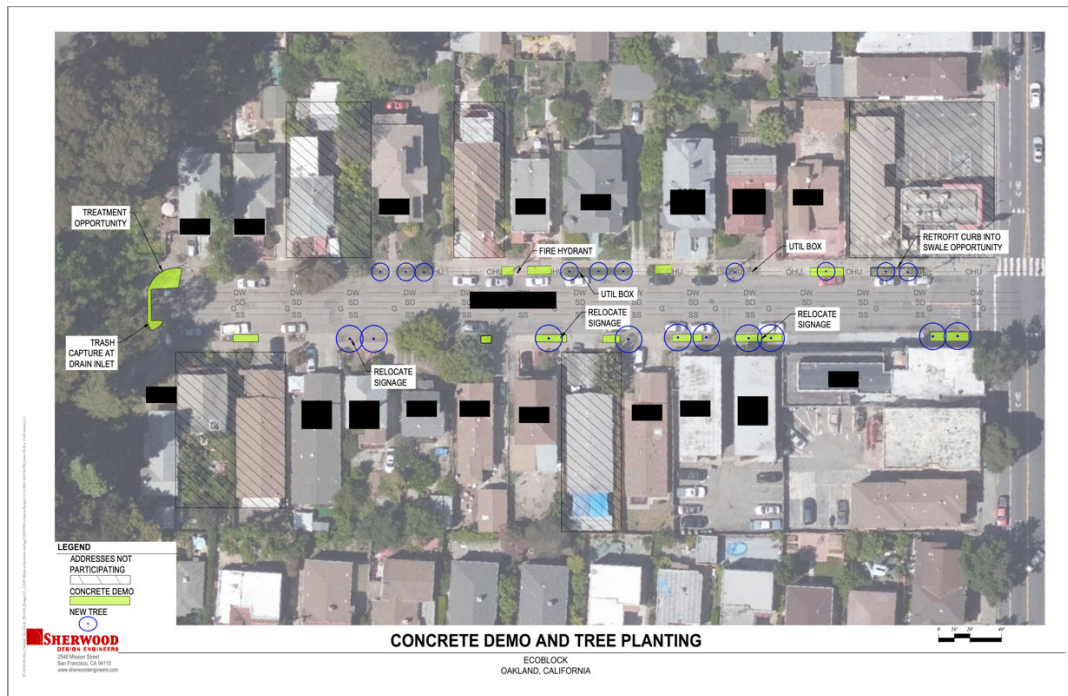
Schematic of concrete demolition work. Credit: Sherwood Design Engineers
